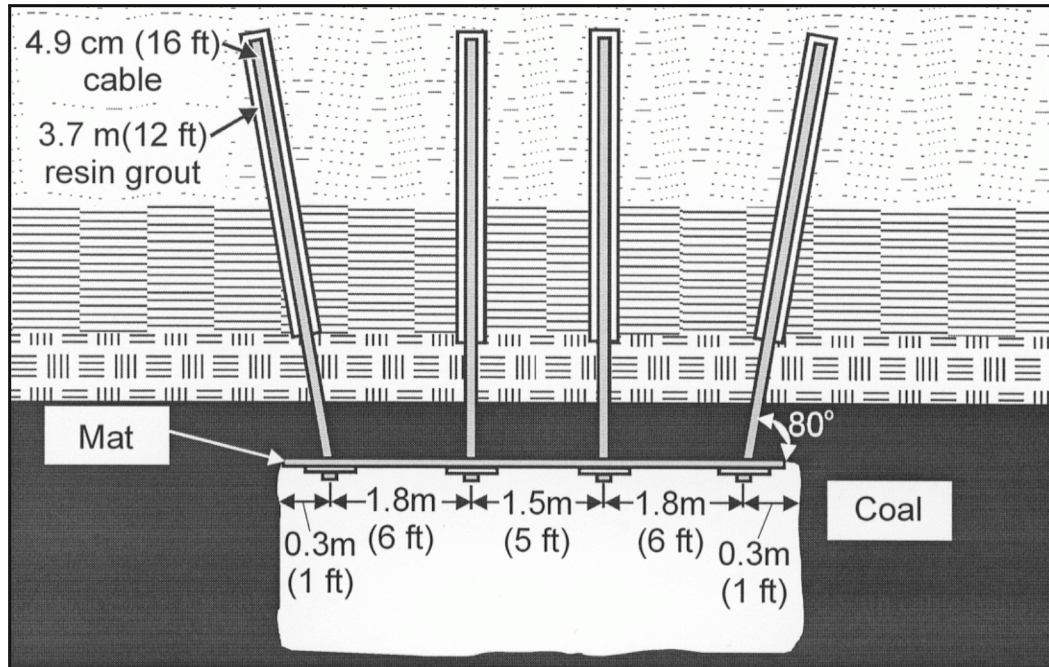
Cross section of tailgate entry showing cable bolt design for case history 1.
